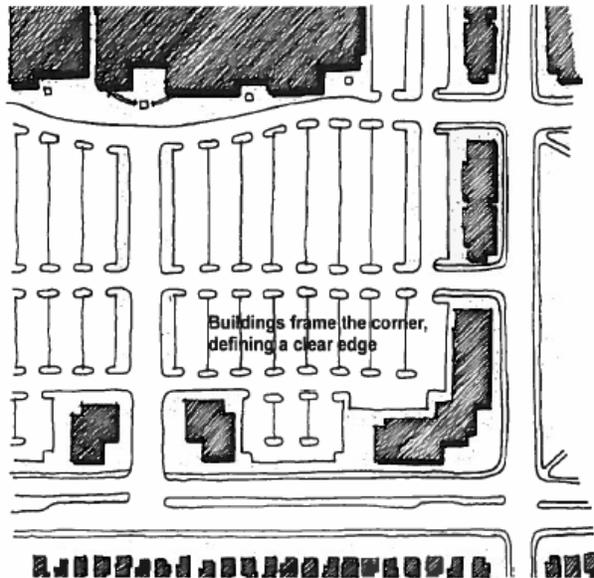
In this development pattern, most buildings front directly on the street and define a clear edge. The pad site on the corner makes a strong architectural statement and announces the center. Parking is typically on the interior of the block.
